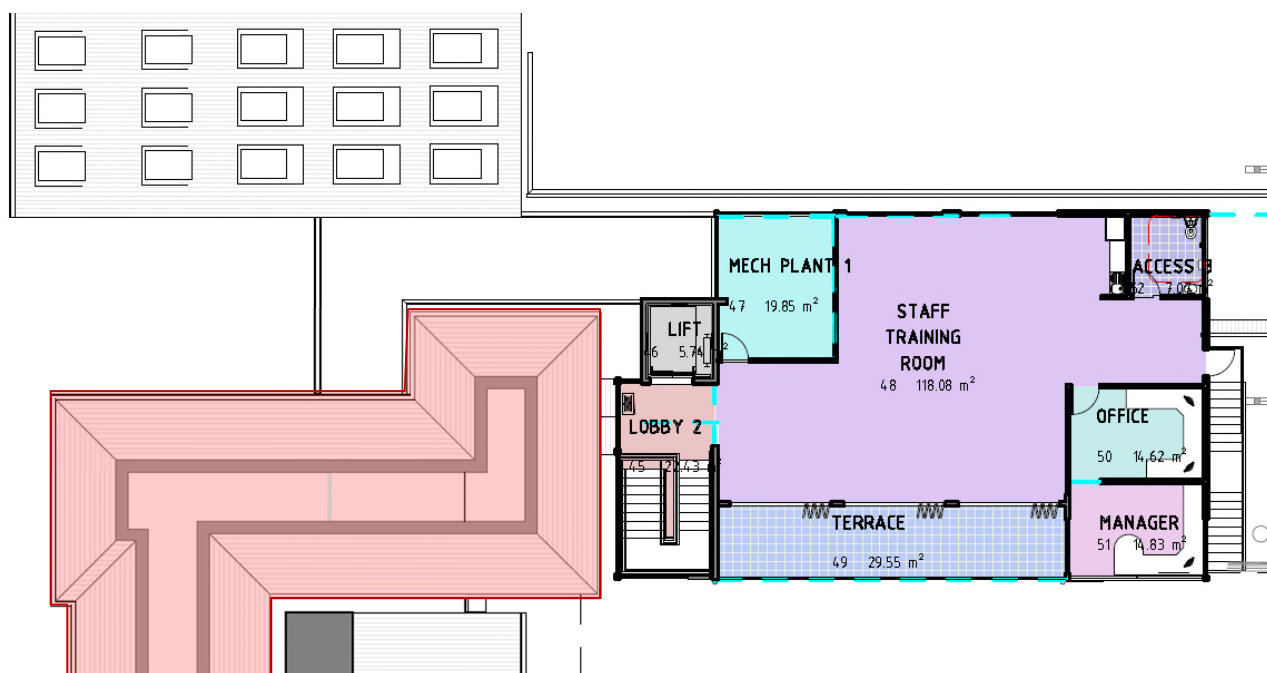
Proposed New DA 2019 above - First Floor Plan detail showing original roof form of Enfield Olympic Swimming Pool ALL retained to view both from outside and within the pool enclosure area (Red Tint).
